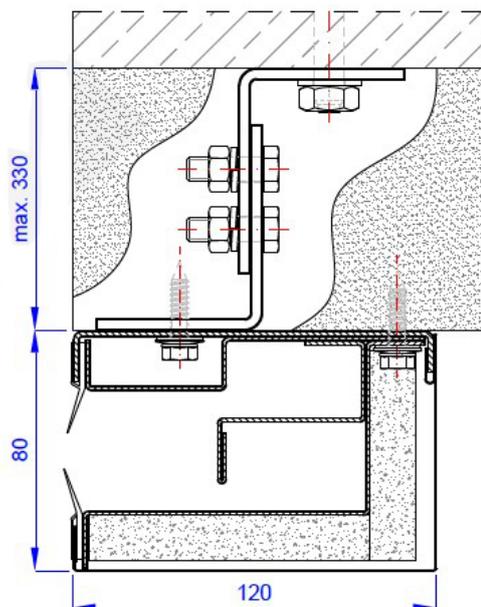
Guides mounted on spacer brackets – intermediate installation
